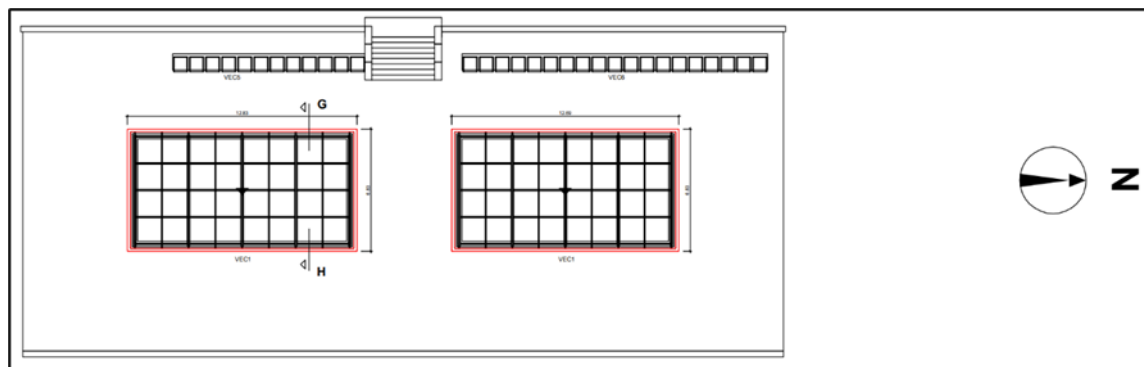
Roof plan and orientation of Pavilhão de Informática II
